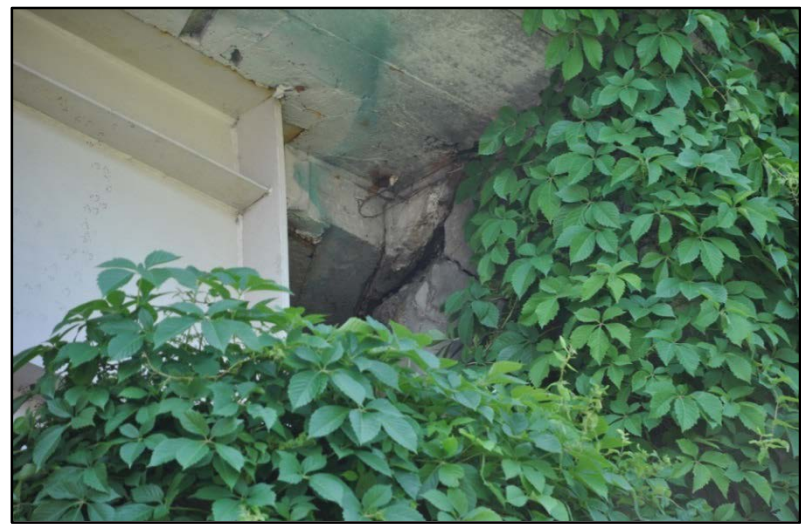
I-65 over S. Jackson St., Abutment deterioration
